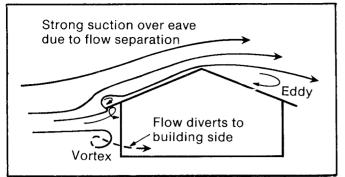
Airflow Past a Building (Side Elevation) With a 5 in 12 Roof Pitch (Flow Pattern Will be Similar for any Roof Pitch Greater Than 3 in 12)
